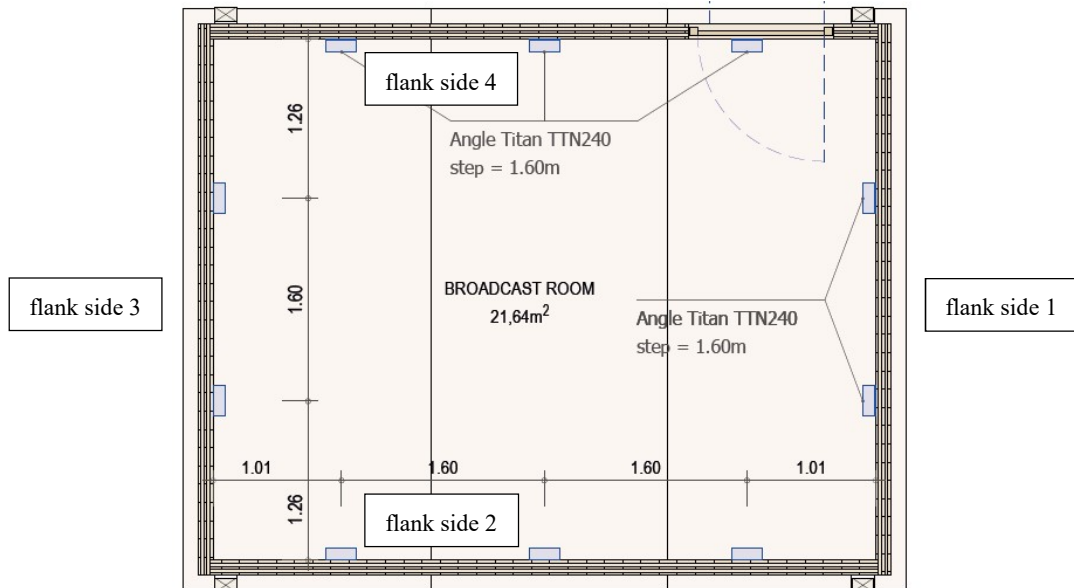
Floor plan - Ceiling test stand - Angle mounting arrangement - Titan TTN240
